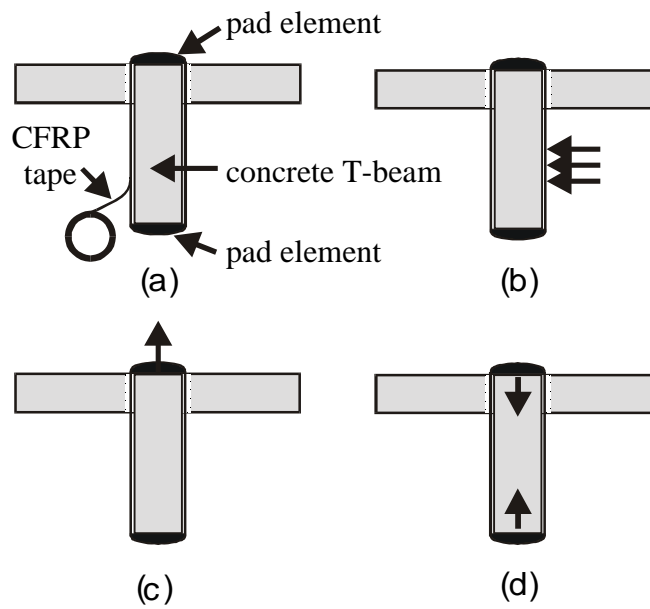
Practical application of non-laminated strap elements (schematic); (a) wrap beam, (b) fusion bond outer layer to second outermost layer, (c) tension strap, (d) transfer of prestress force to concrete
